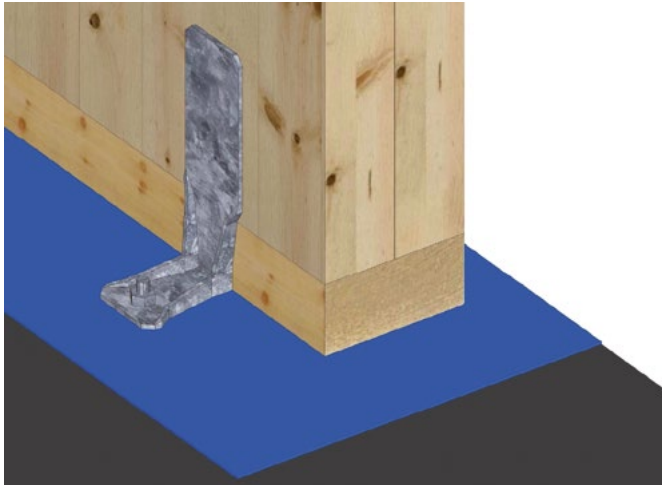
DETAIL OF ANCHORING OF EW124, 84, 62 WITH A SOLEPLATE
